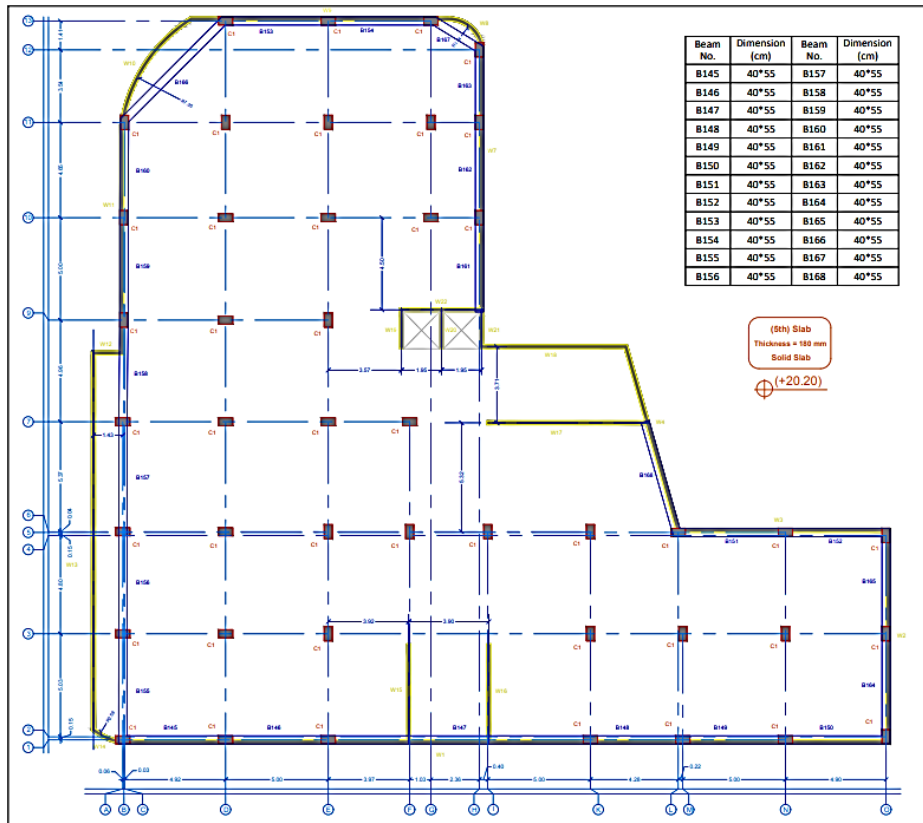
Typical (5th) slab layout and beams distribution.
